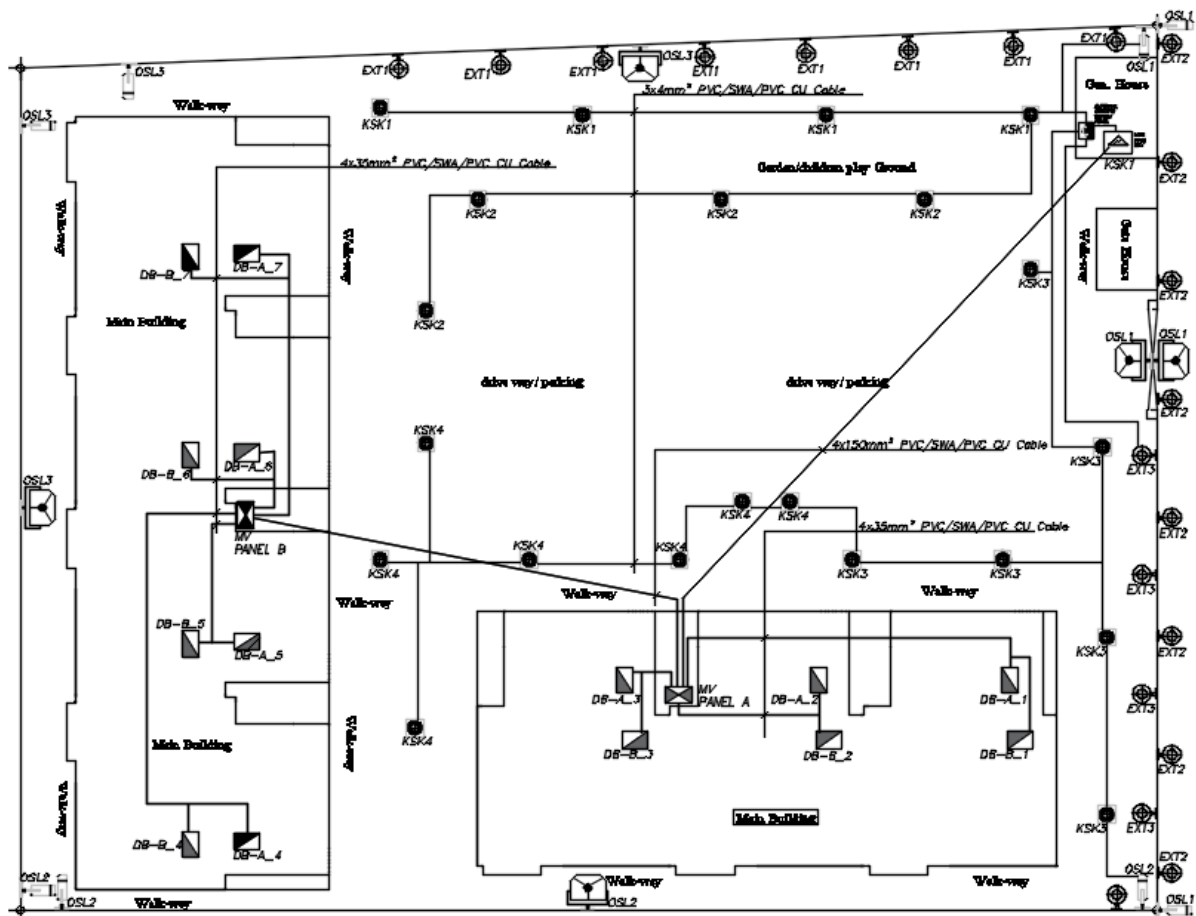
Site Plan-Underground Cables Routes and Outdoor Lighting Layouts
